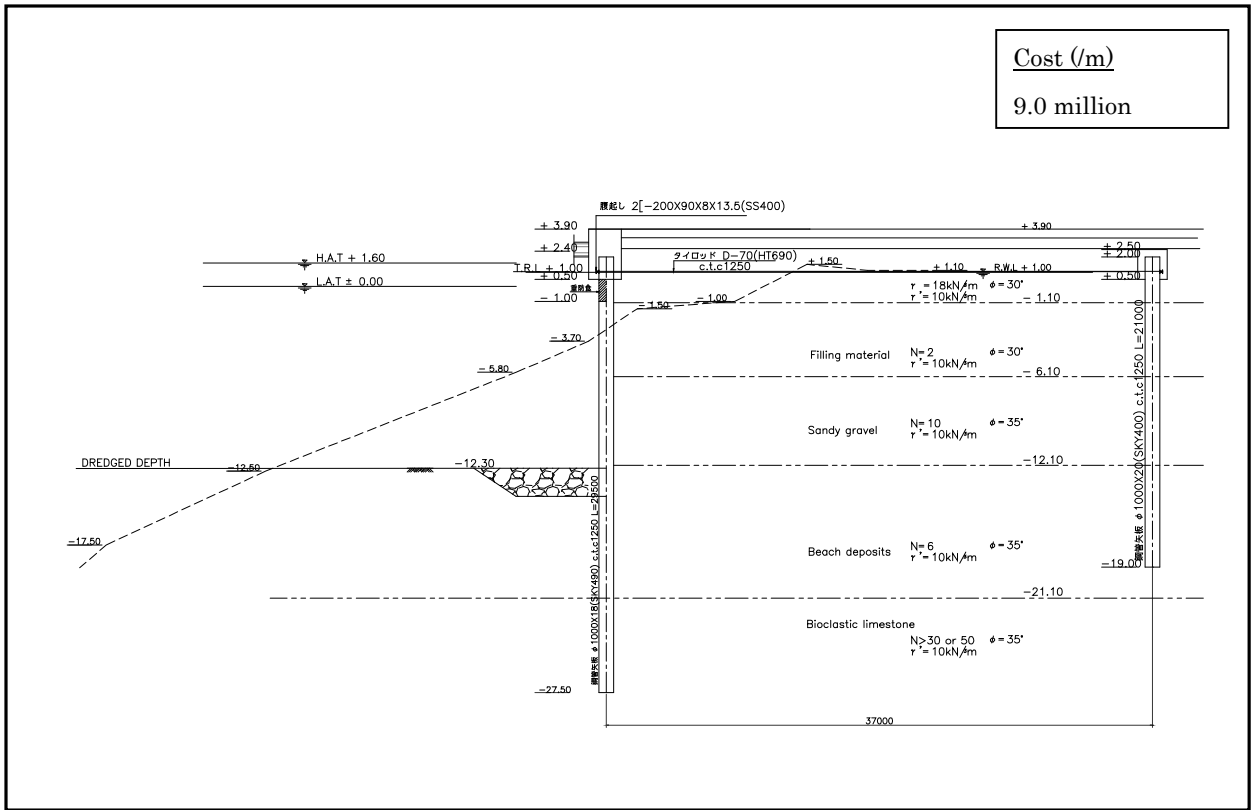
Typical Cross Section of Steel Pipe Pile Type (Option 1)
